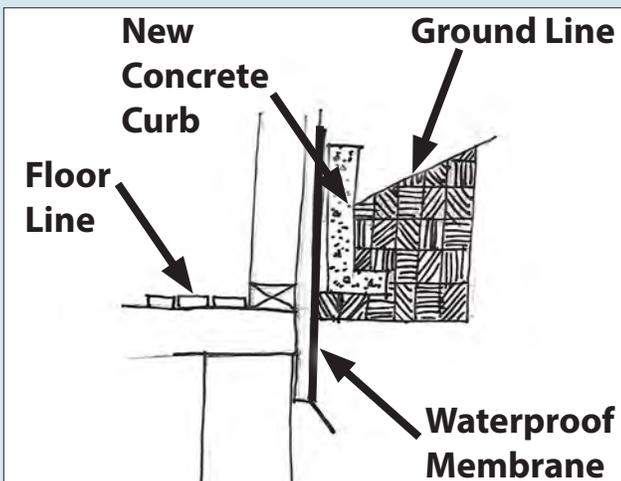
For soil above floor line add waterproof membrane and a concrete curb.
